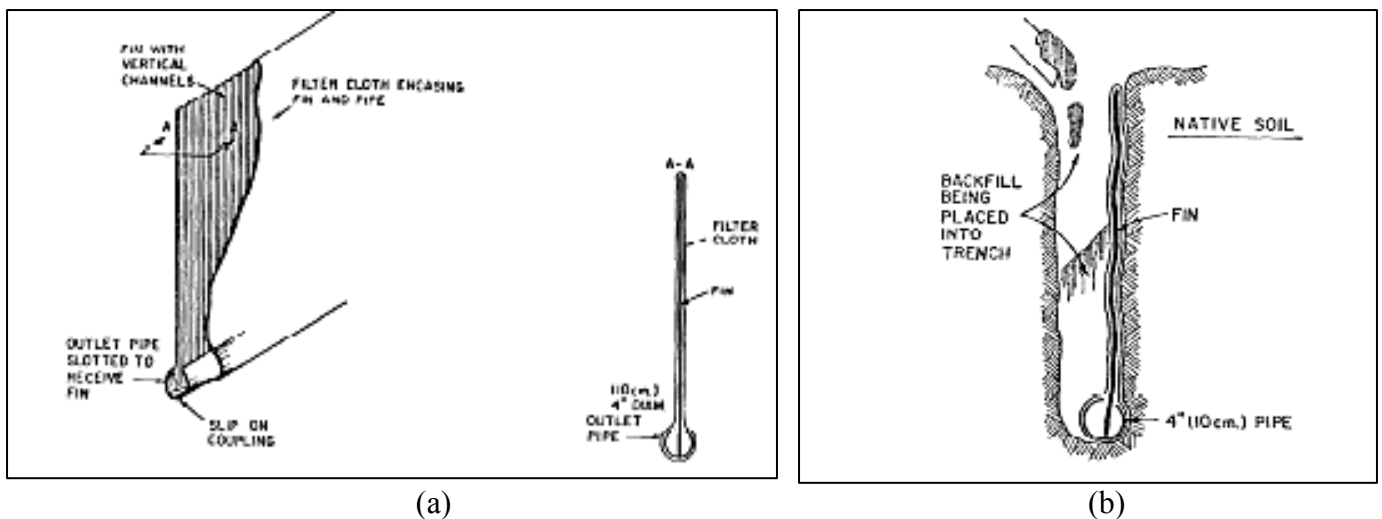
Typical (a) components of prefabricated fin drains, and (b) installation of prefabricated fin drain in trench (Healey and Long, 1972; ERES, 1999).
